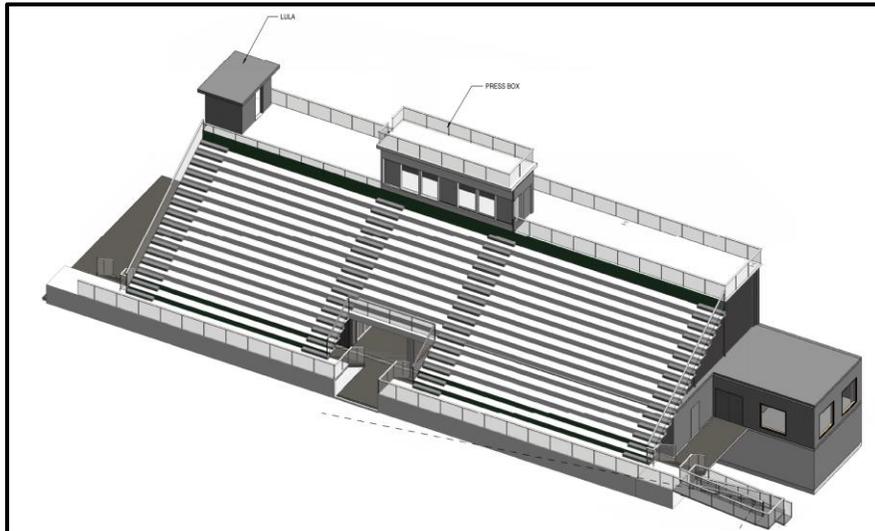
AXON ELEVATION VIEW OF BLEACHER SEATING AND PRESS BOX
